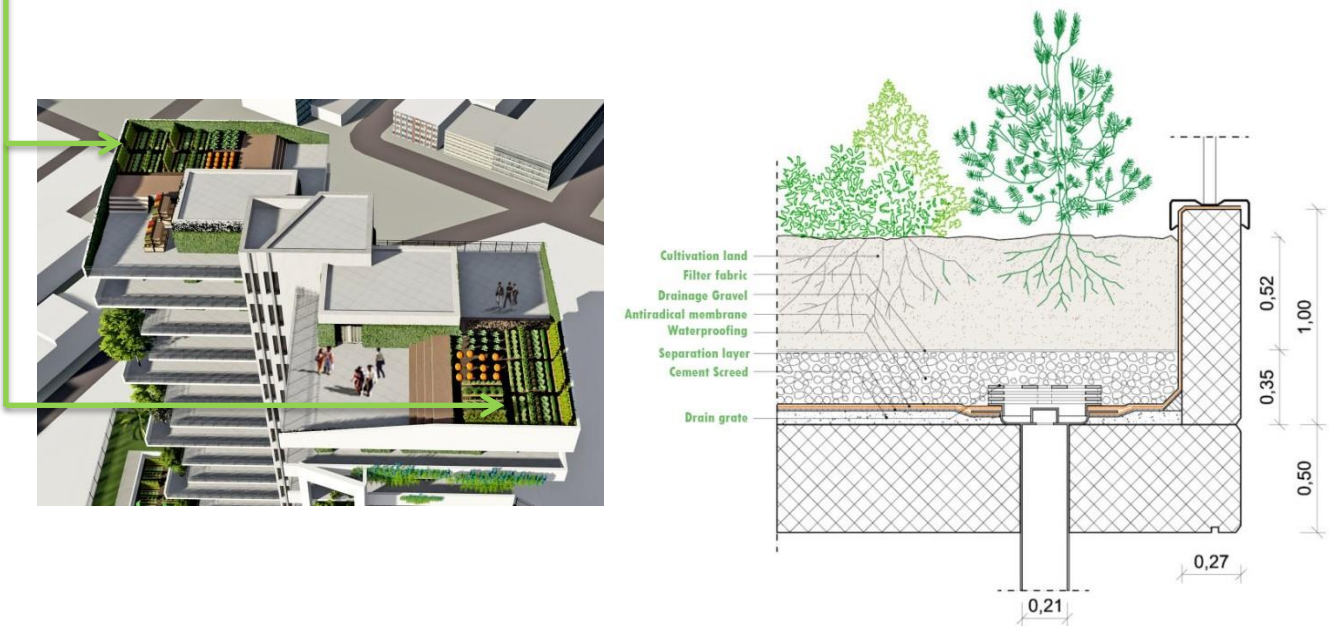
Bird Eye view roof top Farming (a) & Detail of Green roof on slab (b)
